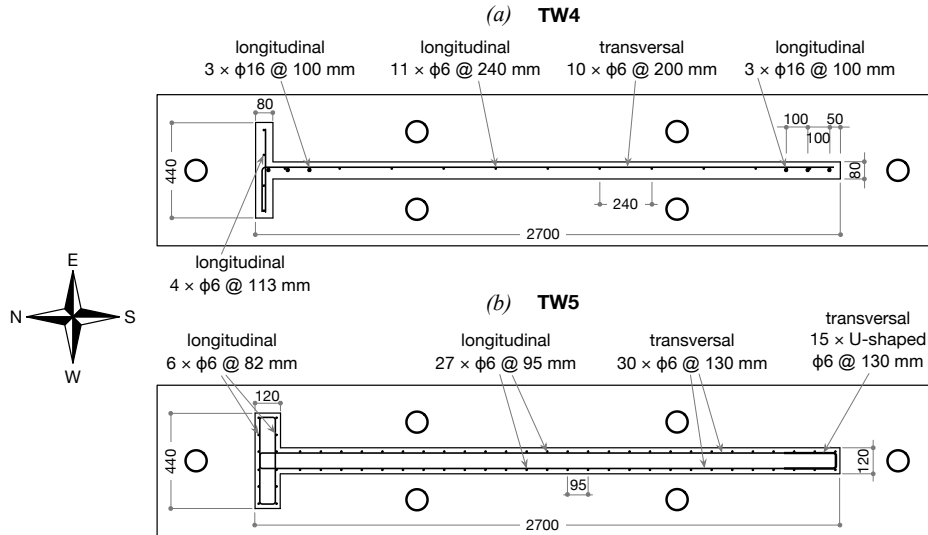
Cross-sectional layout of walls tested at EPFL: (a) TW4 and (b) TW5. All dimensions are in mm.
